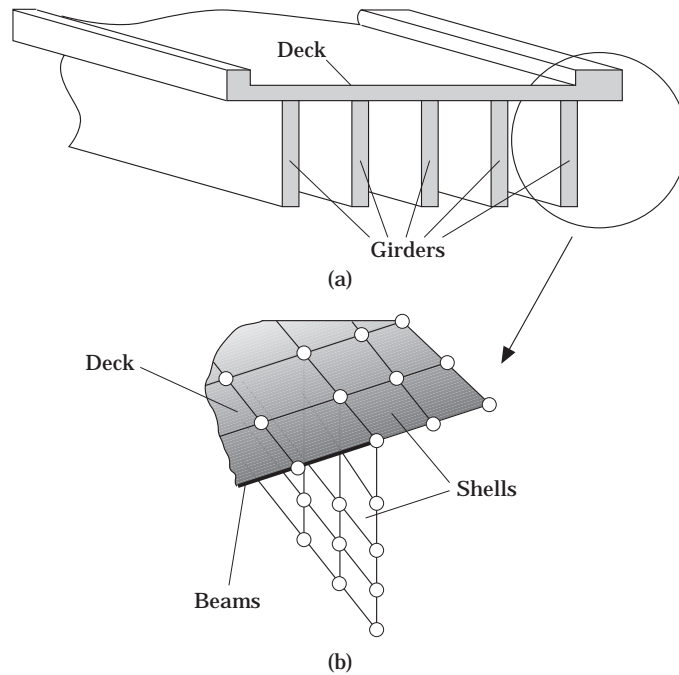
The Senneterre concrete bridge: (a) bridge model and transverse section representation; (b) finite element representation.
